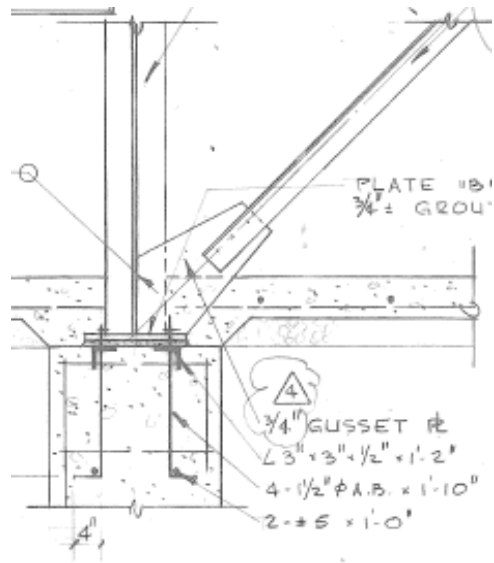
Bottom Connection Detail (88UT1A--A-1516-1)
